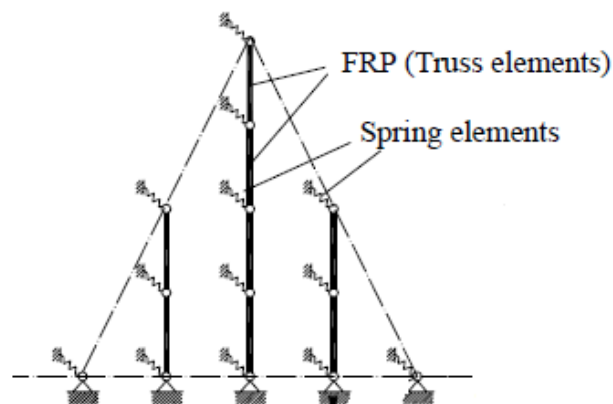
Interfacial element for shear strengthening (Lu et al., 2005b)
